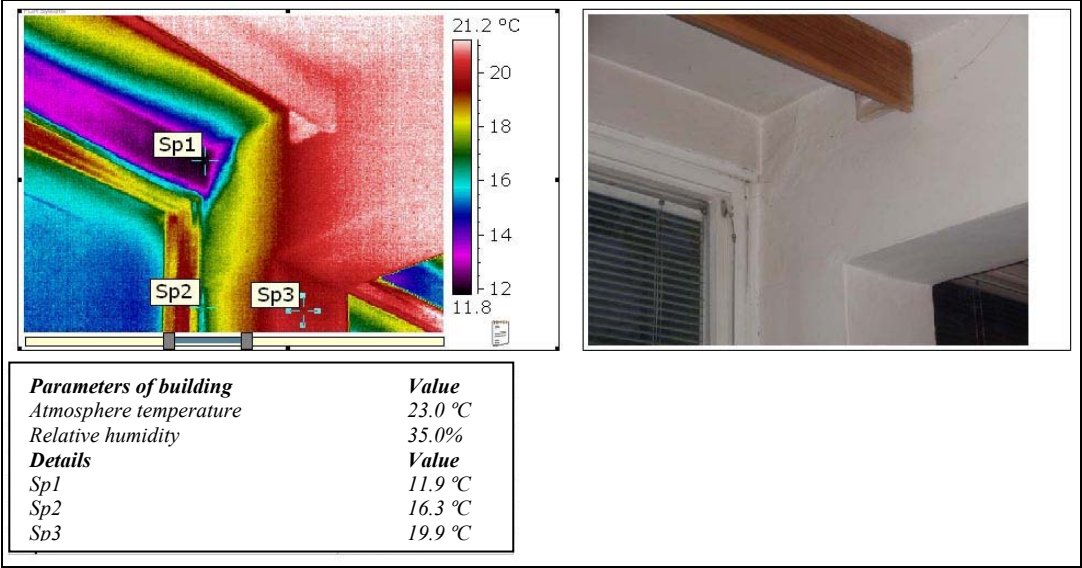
Thermo-visual image of building without thermal insulation (interior)
